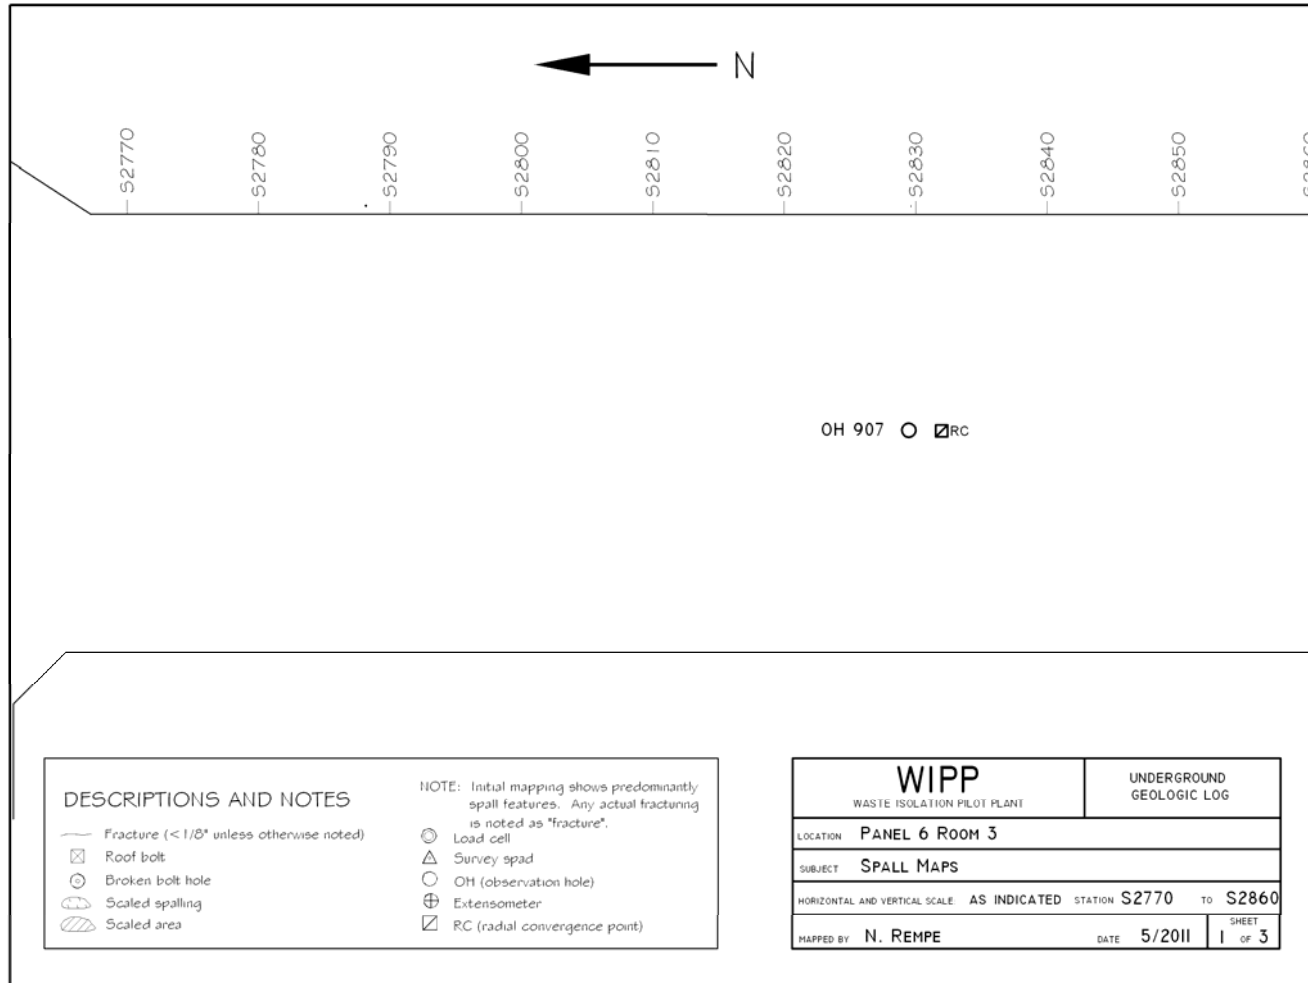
Panel 6 Room 3, S2770-S3060 Roof Fractures (Sheet 1 of 3)
